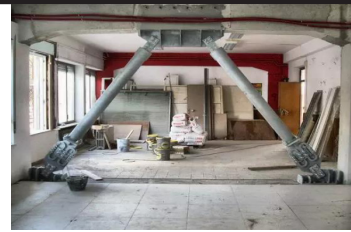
A photo depicting the use of eccentrically steel braced frames (Asadimanes, 2025)
